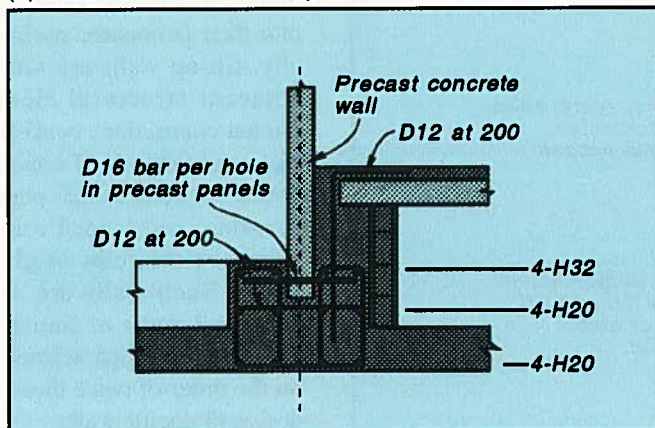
Construction of a two-story building incorporating full height precast concrete wall panels (Ref. 3).
